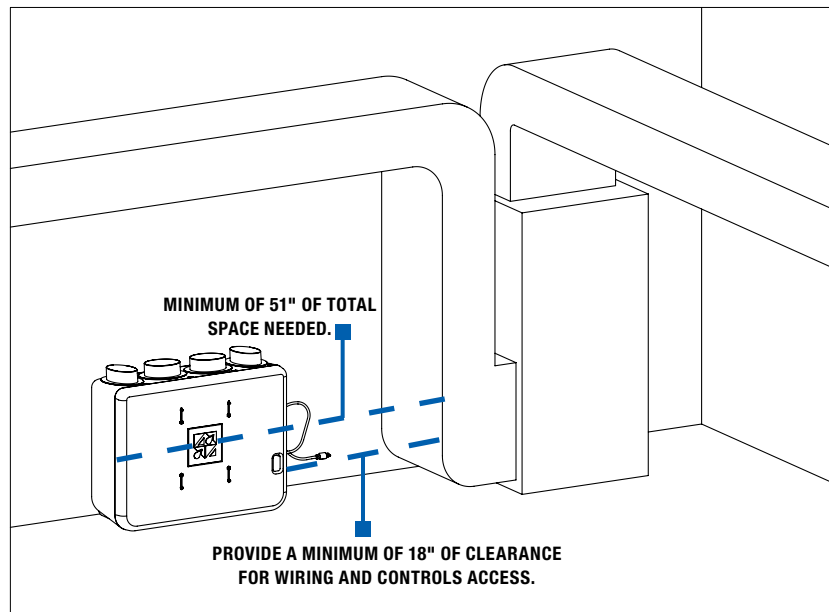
UNIT MOUNTING CLEARANCE
